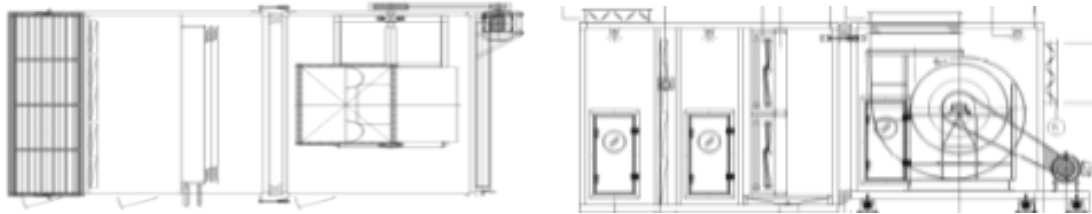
Floor plan of Air handling unit in Gamjeon and Sasang subway station
